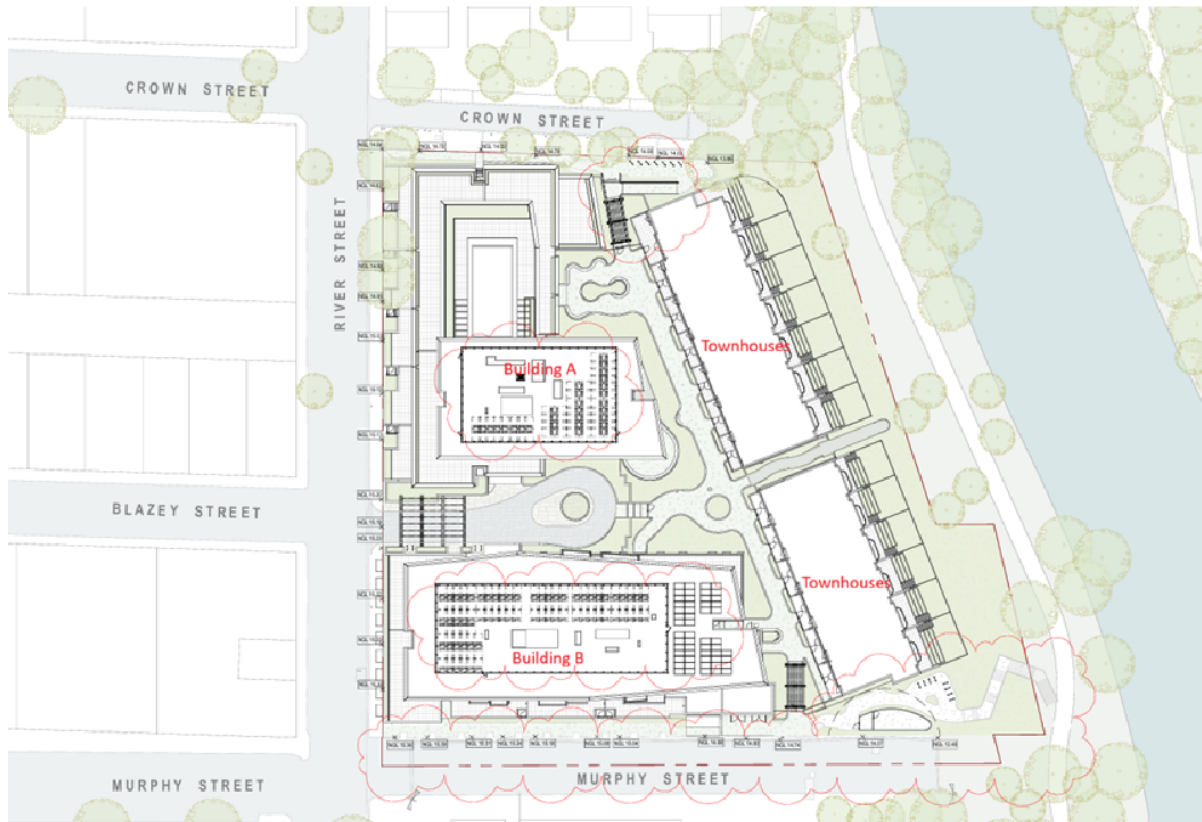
Overall Site Plan (Source: Extracted from Architectural plans prepared by SJB Architects – dated 01/05/2026 - Revision 2) and modified to identify each building.
